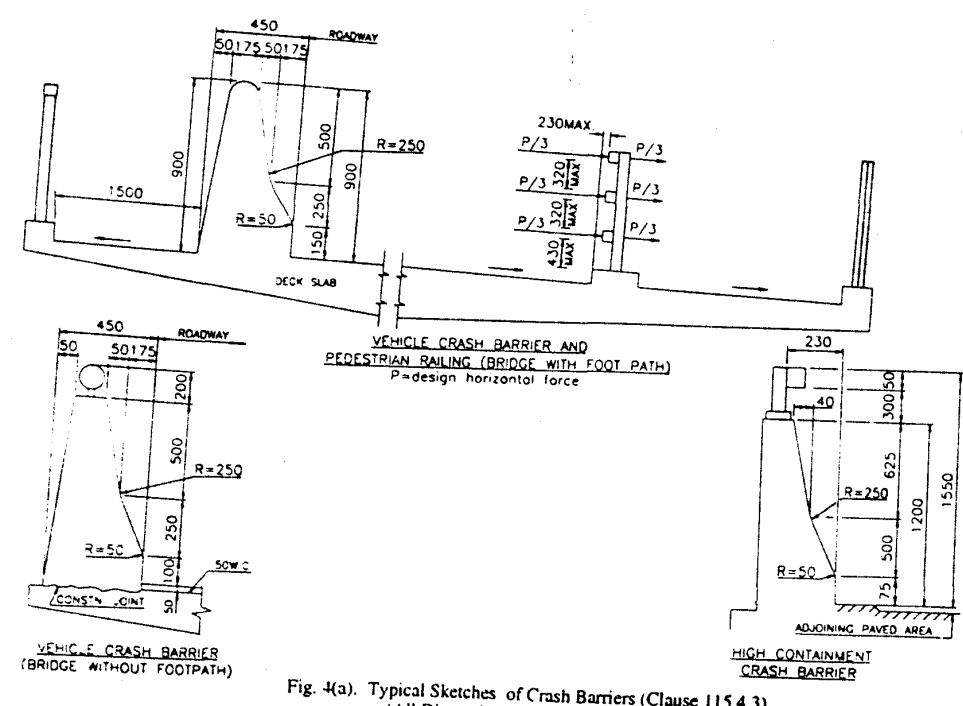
(a). Typical Sketches of Crash Barriers (Clause 115.4.3)
